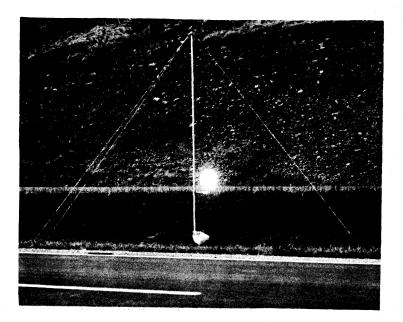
Mounting assembly for floodlights consists of 12-foot pipe welded to automobile wheel, guy wires, sand bags, and specially designed arm on light. The luminare is lighted.
